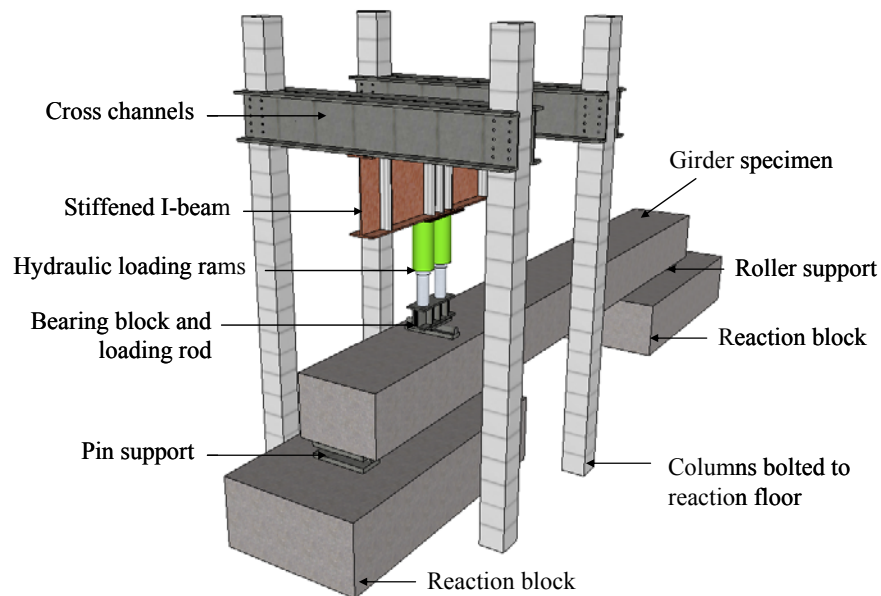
Schematic of loading frame components and assembly for flexural tests.
